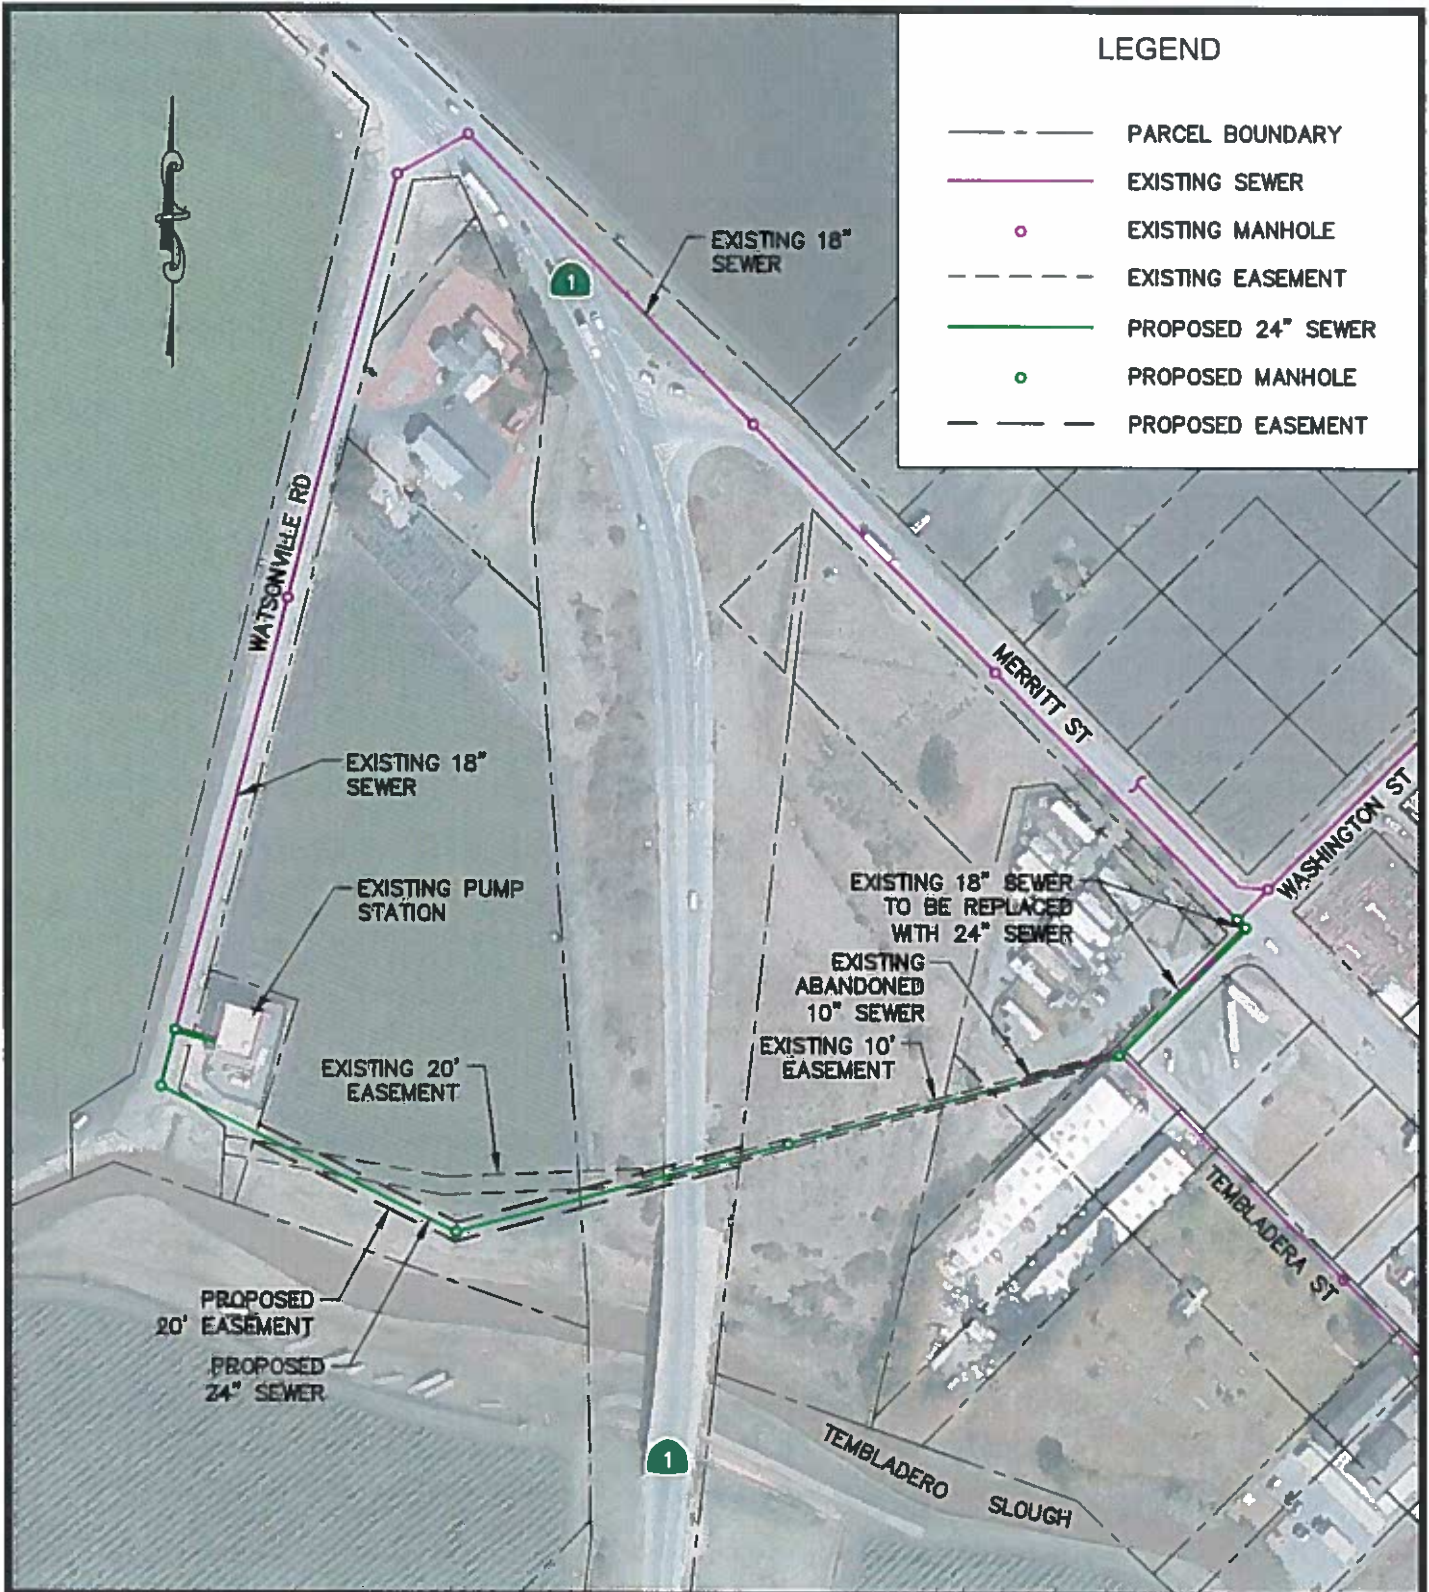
PROPOSED 24-INCH SEWER BYPASS IMPROVEMENTS
